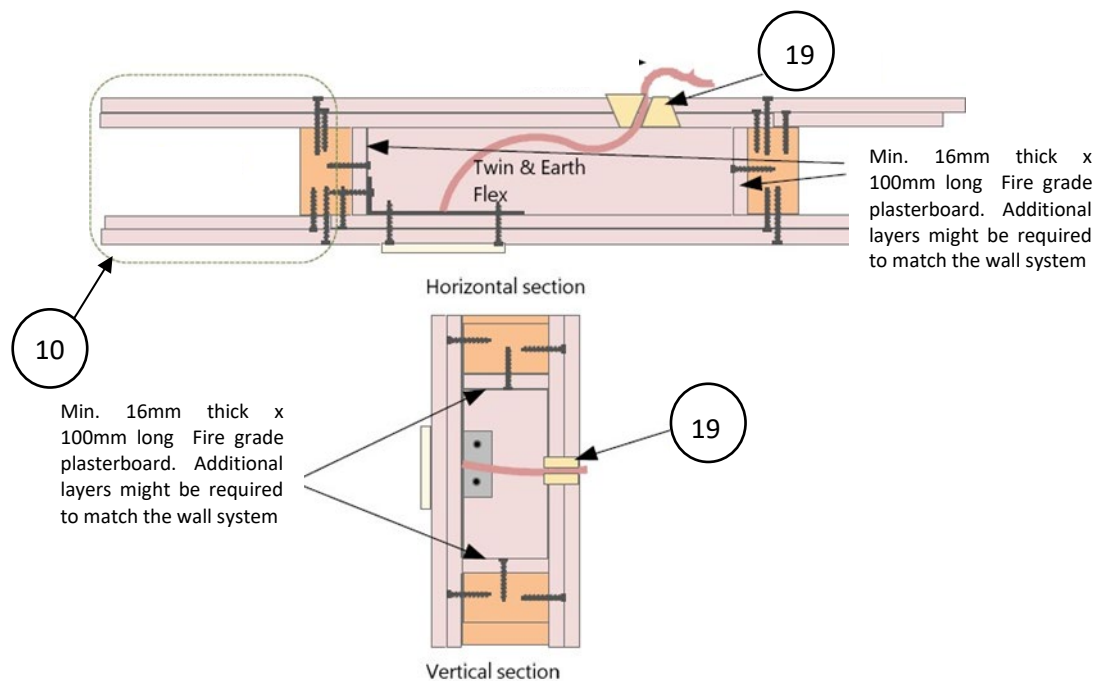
Framing out of GPOs in double stud timber-framed construction – Plan and section view
